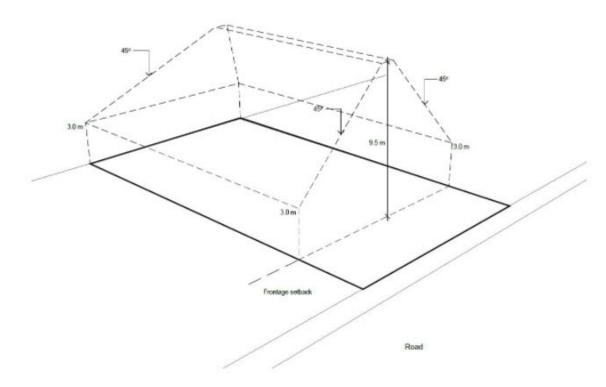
Building envelope for corner lots as required by clause F5.6.2 A3(a) and clause F5.7.1 A2(a)
